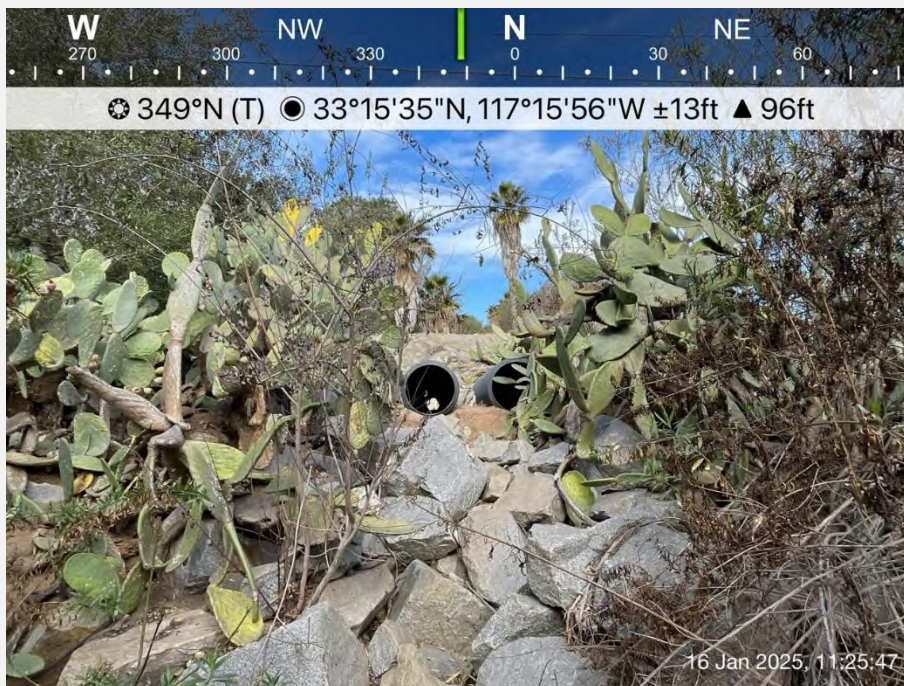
Culvert outlets and riprap of NWW-02 south of North River Road, facing north (Photo Point 6).
